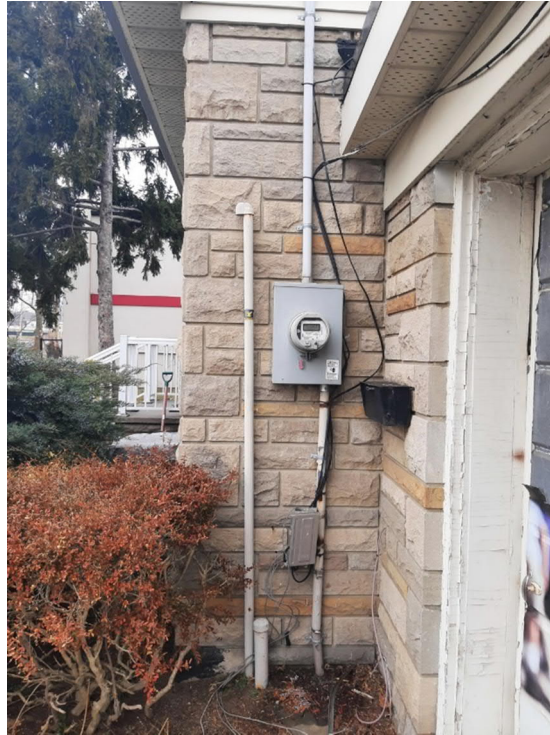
View of the back yard of the Site, facing northwest.
